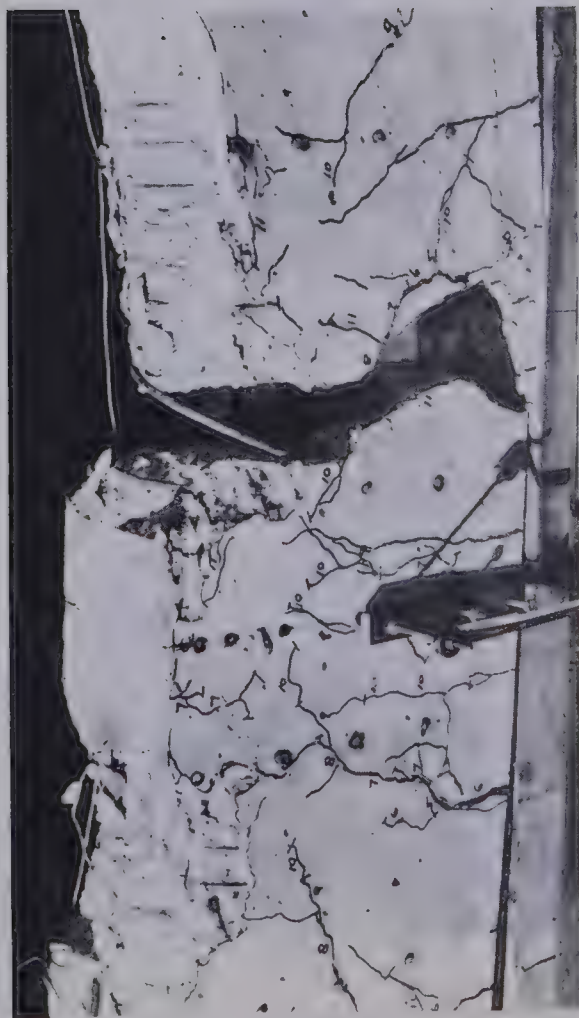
SPALLING AT THE COMPRESSION ZONE IN BEAM D1
